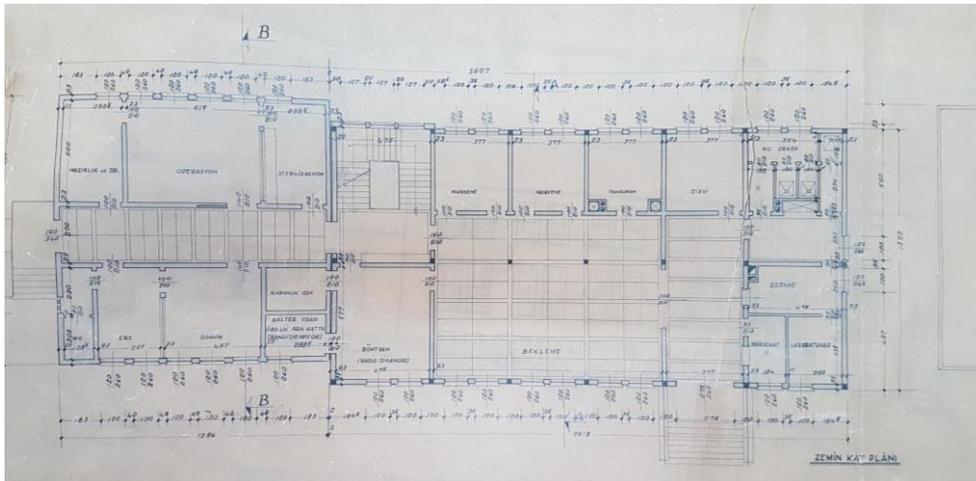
The ground floor plan of the hospital (Source: TTK Archive, 2020)
